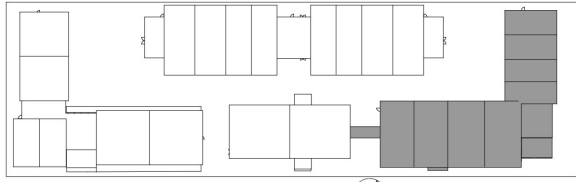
Building C: One-Bedroom Residence-Second Floor Plan | Scale: 1:200.
